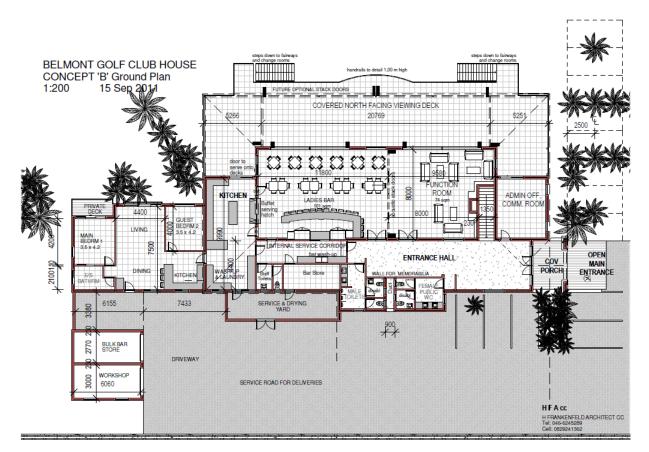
Layout of the Ground Floor of the proposed clubhouse.
